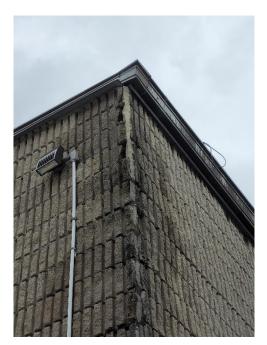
Damaged Split Ribbed Block at Southeast Corner
